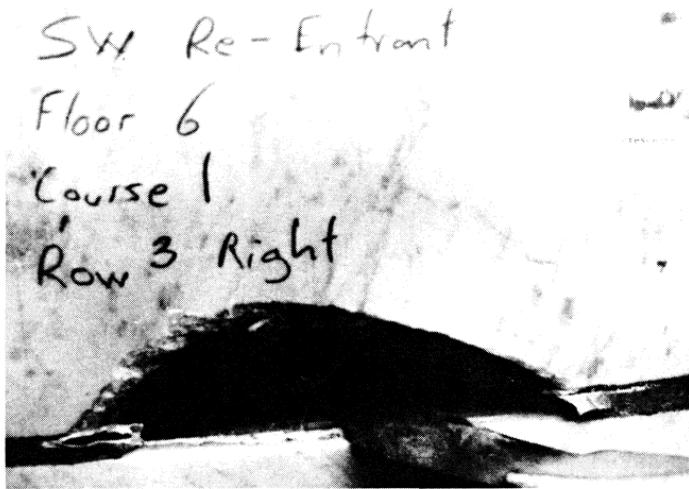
View of crescent shaped crack and fracture that occurred in marble panels after fine, vertical cracks in the panels at connections were lightly tapped.
